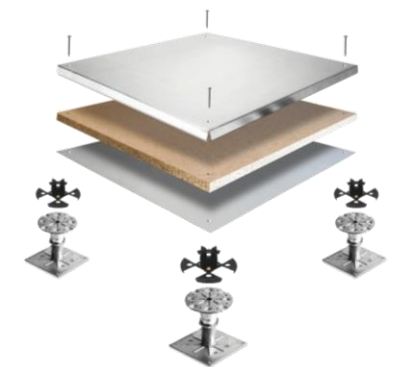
Kingspan Exploded View of Raised Access Flooring to demonstrate disassembly
